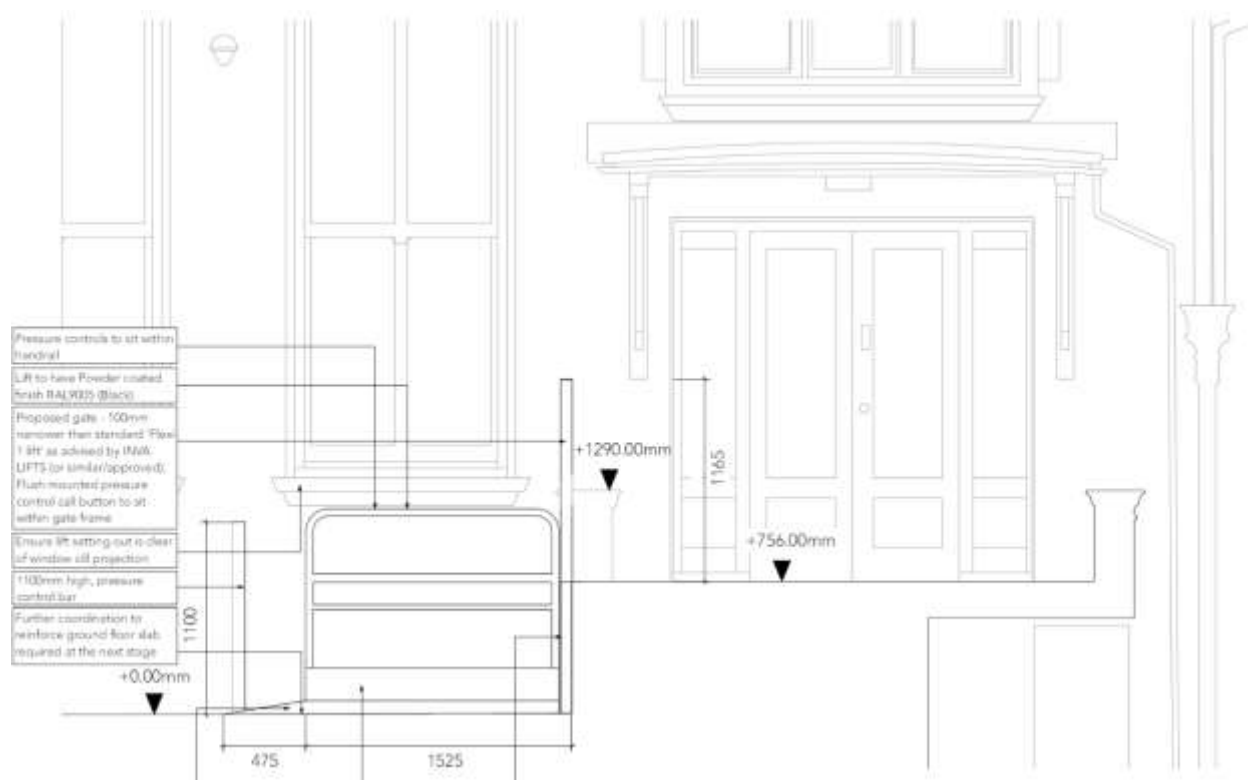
Proposed Section 01. The sectional cut of the drawing reveals more of the lift mechanism than would be appreciable when looking in this direction.
